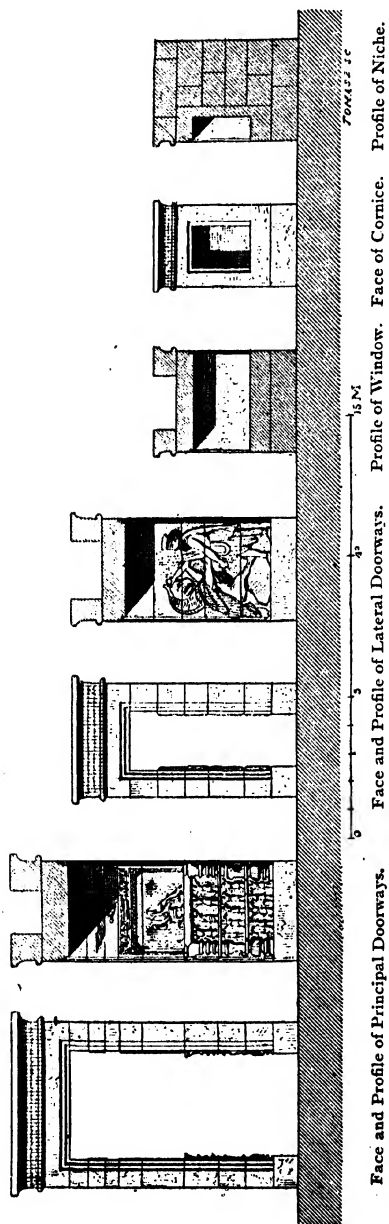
Elevations and Sections of Doorways and Windows of a Palace at Persepolis. (F.C.) (P. & C.)
